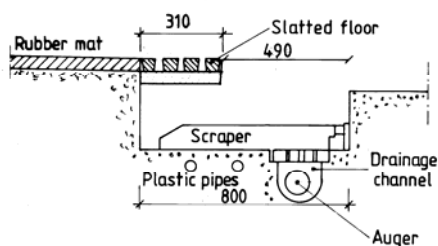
Design of the stall floors and the manure gutters after rebuilding.
